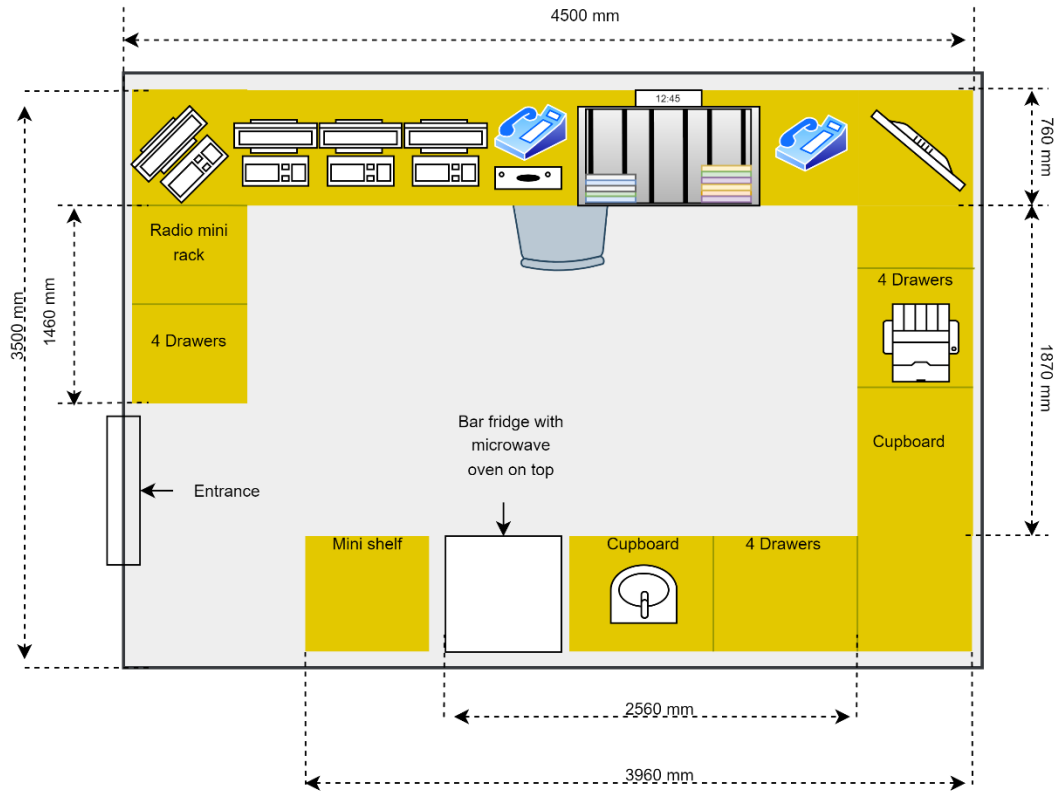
FAVG Tower Console Layout5.2.2.2 FAVG Tower Equipment
